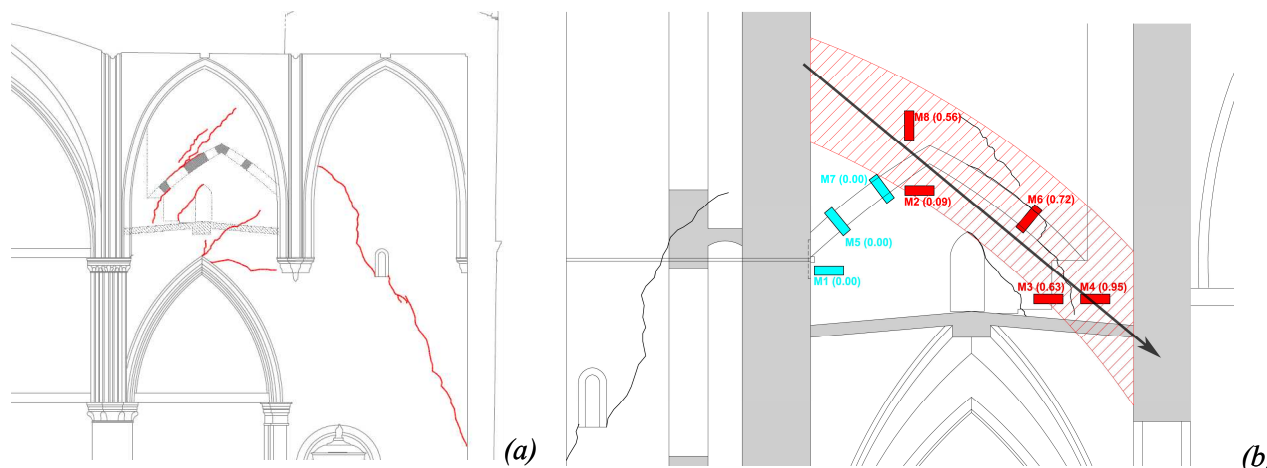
Full-open cracks on the South-East side of the bell tower, along the transept (a). Load transmission from the tower (on the left) to the church's column (on the right) (b)
